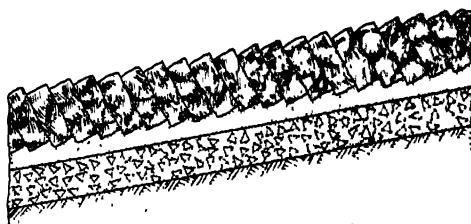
Laying Stone Pavement on Steep Grade by Tilting Blocks.
